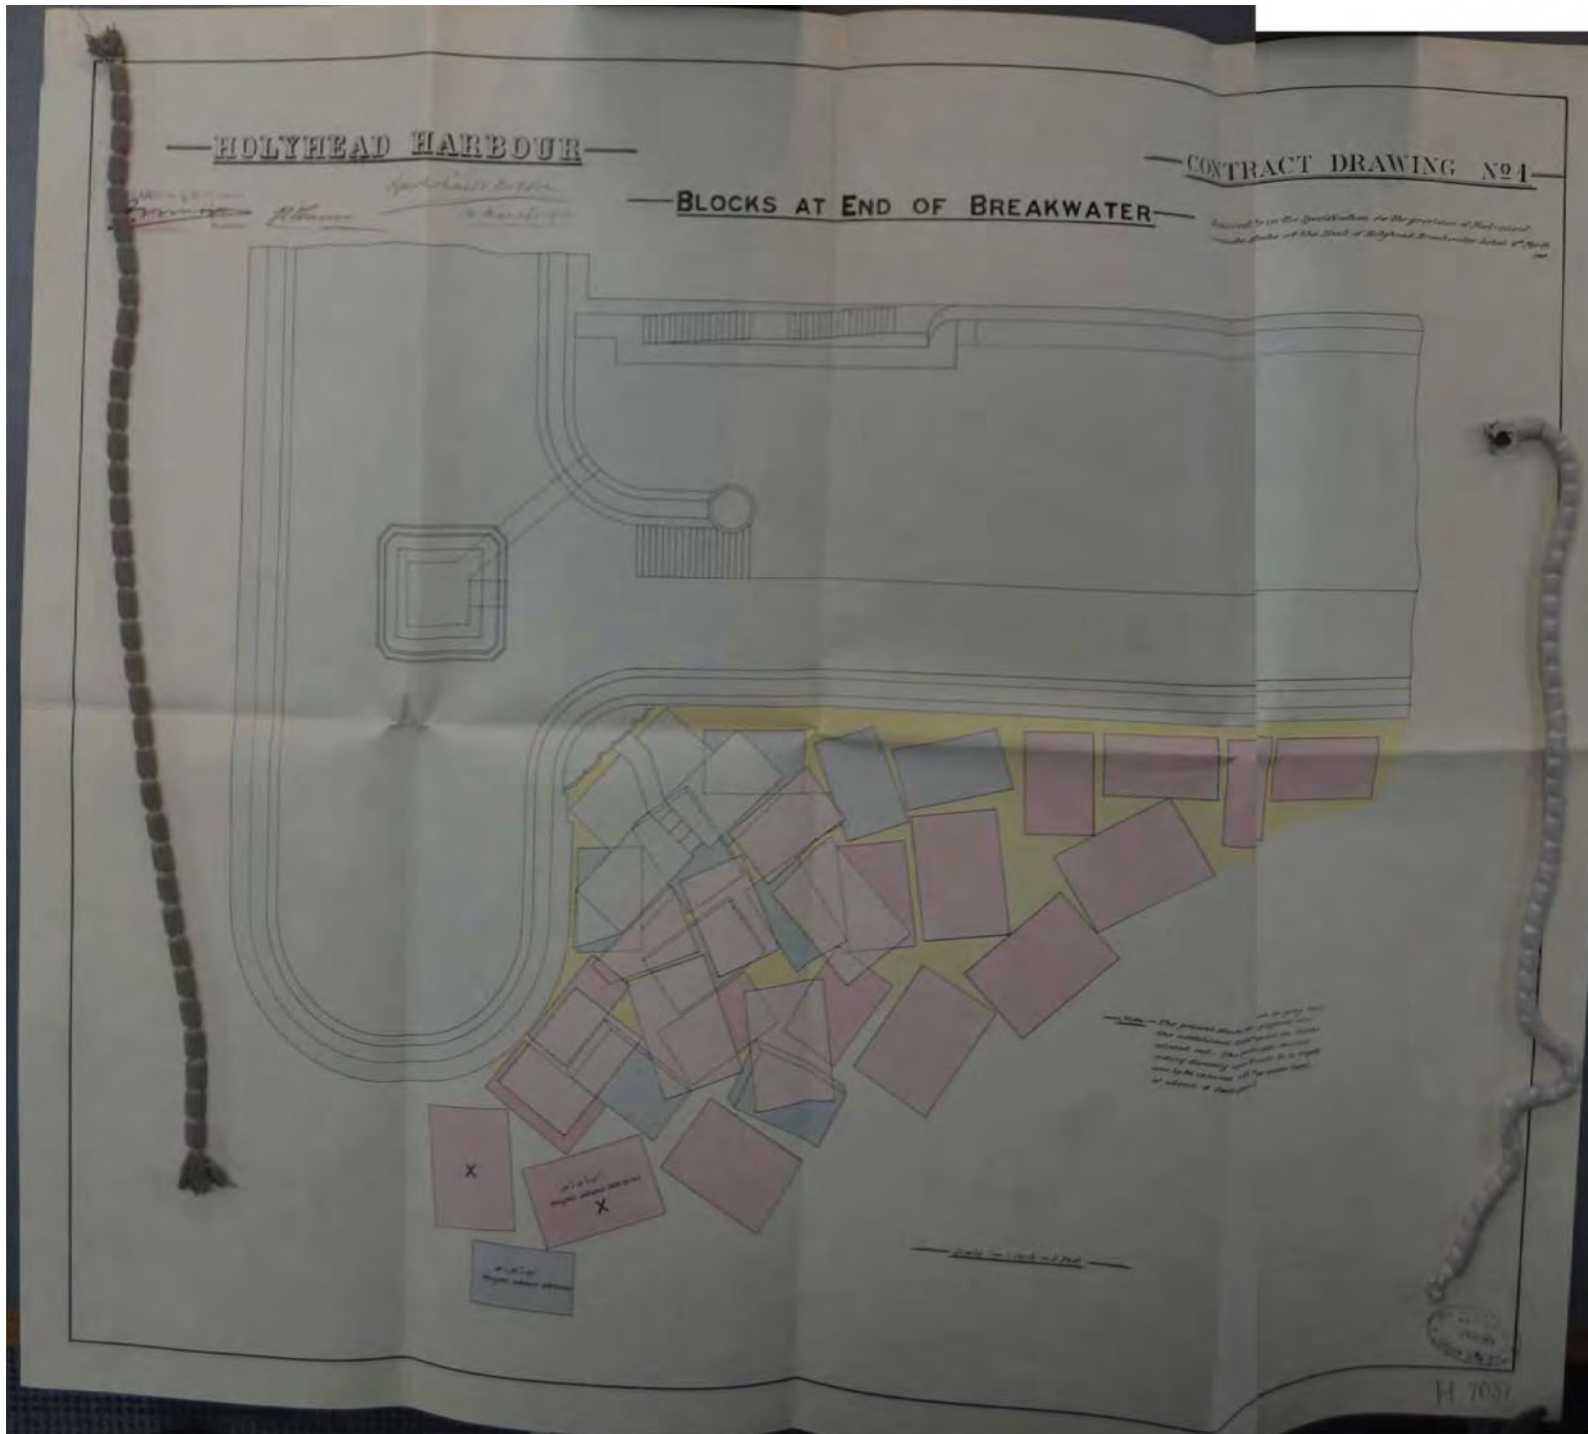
Plan showing steel encased stones deposited at the north-east end of the breakwater in 1914 as a protective measure (National Archives, RAIL 837/32).
